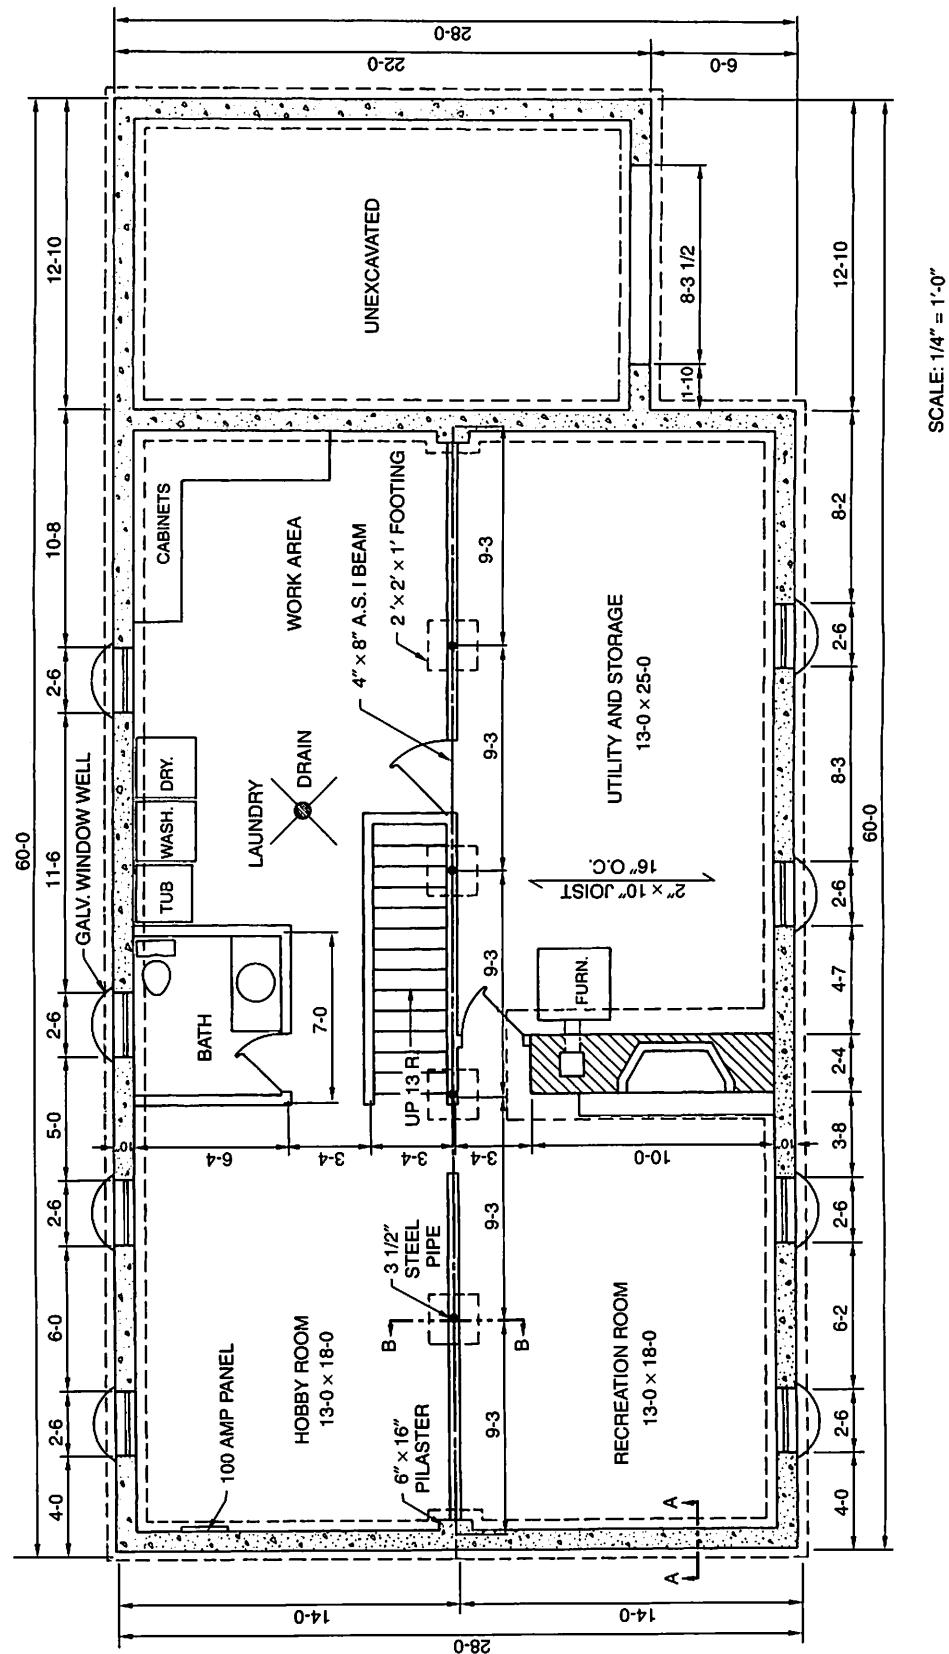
A completed basement plan. The foundation walls are cast concrete and the structure has a stud wall frame.
